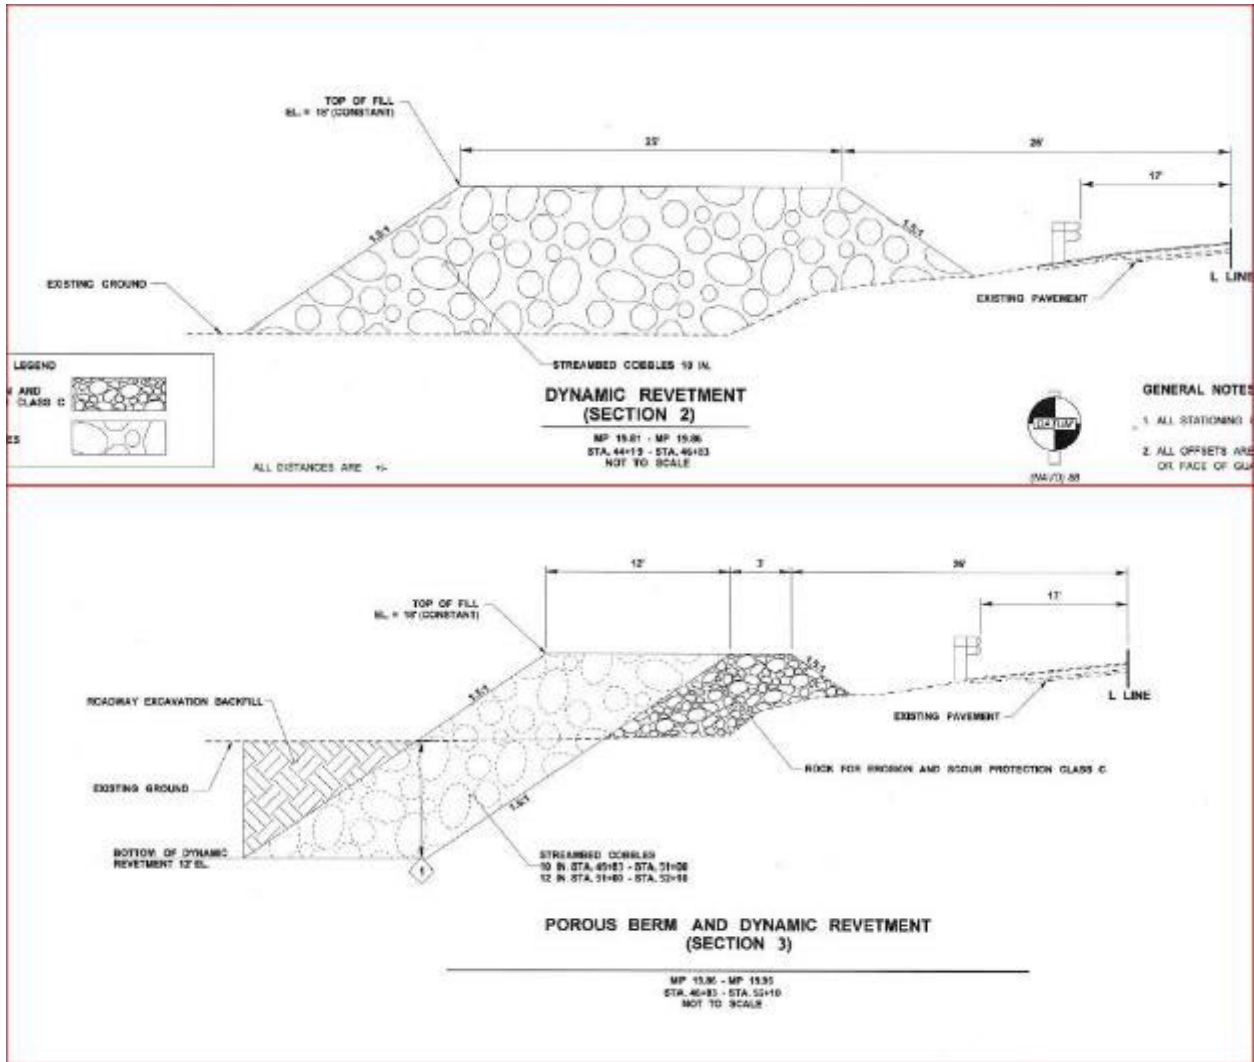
Cross-sections of pilot dynamic revetment as built in 2017.
